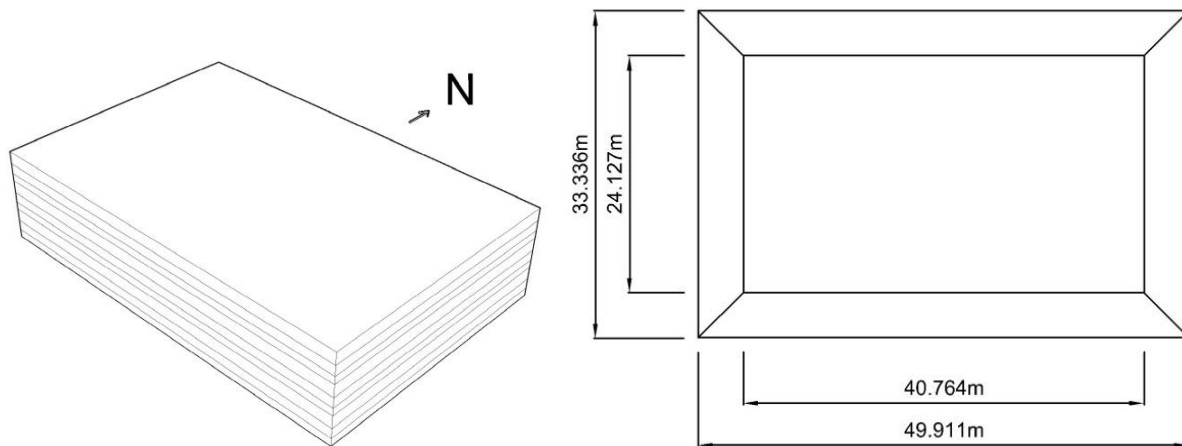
Schematic 3D image and floor plan of the medium sized office building
